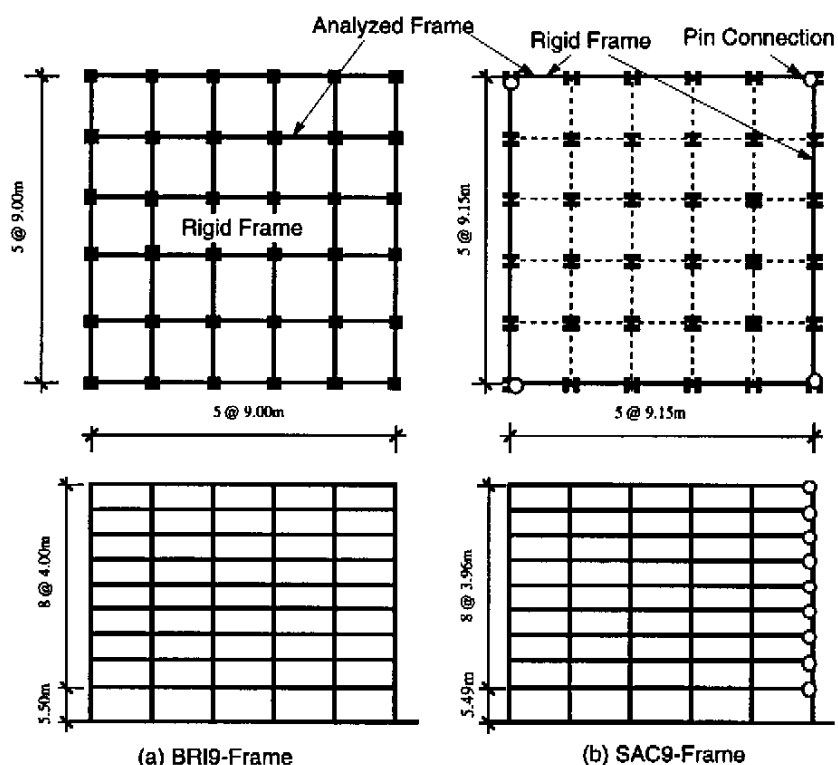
Plan views and analyzed frame elevations for 9-story buildings
